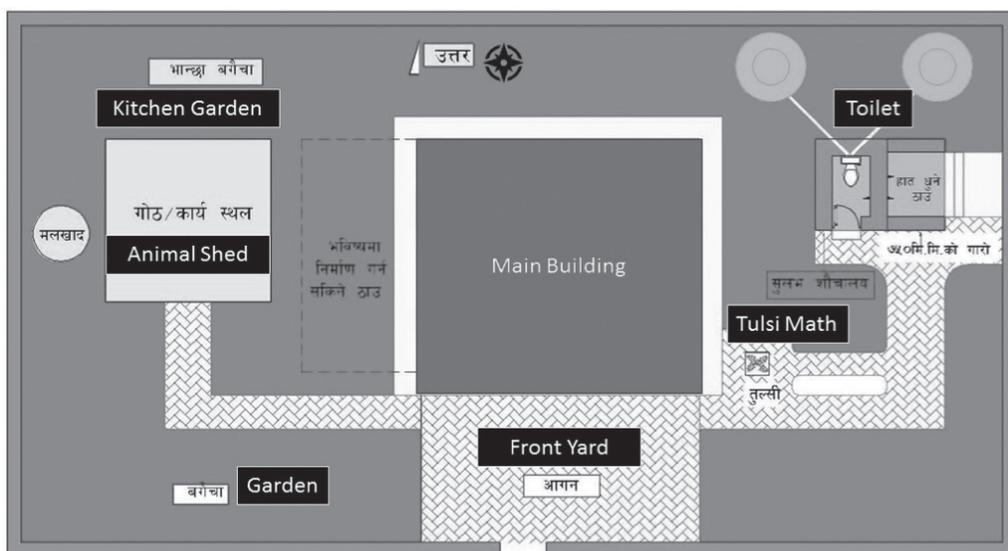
Typical ground floor plan of Village houses in Tumlingtar
